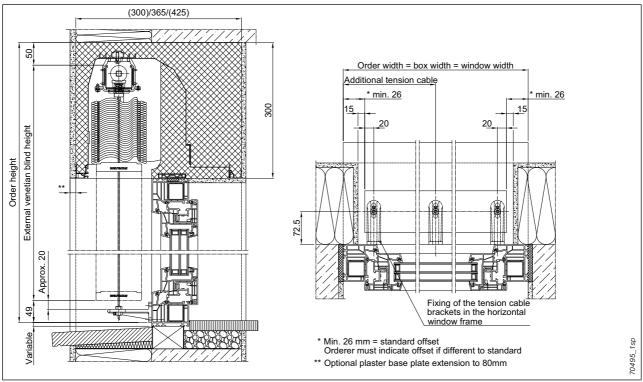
Top-mounted ext. ven. blinds for new buildings NA-RA M with E 90 A2 in 140 mm shaft
